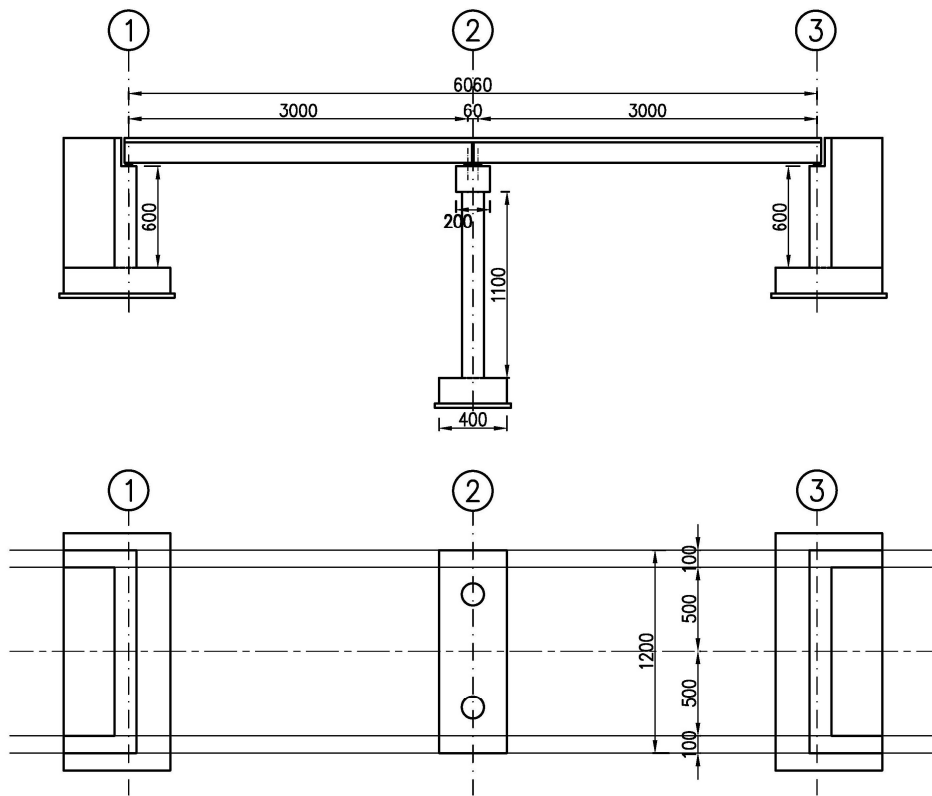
Elevation (top) and plan (bottom) view of the benchmark bridge (Dimensions are in centimeters, drawings are not in scale.)
